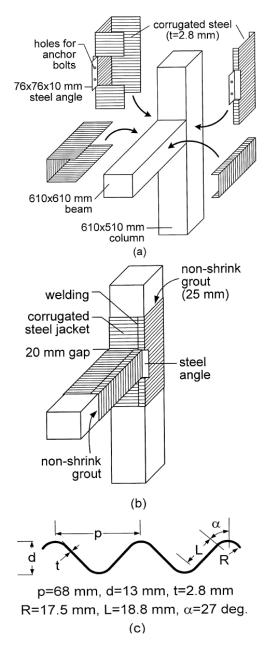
Corrugated steel jacketing (Ghobarah et al. 1997)
